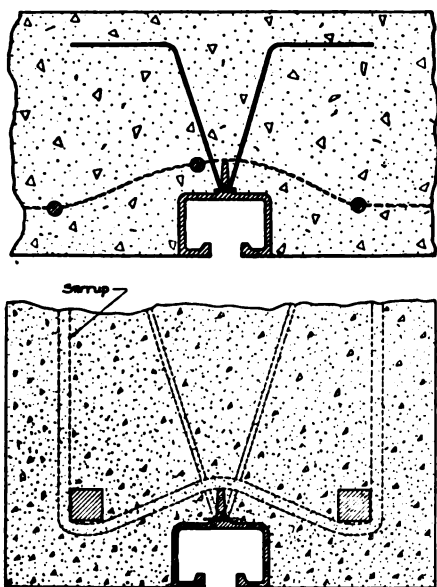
These diagrams show the method of setting the box rail around the reinforcing in concrete slab and beam construction.
